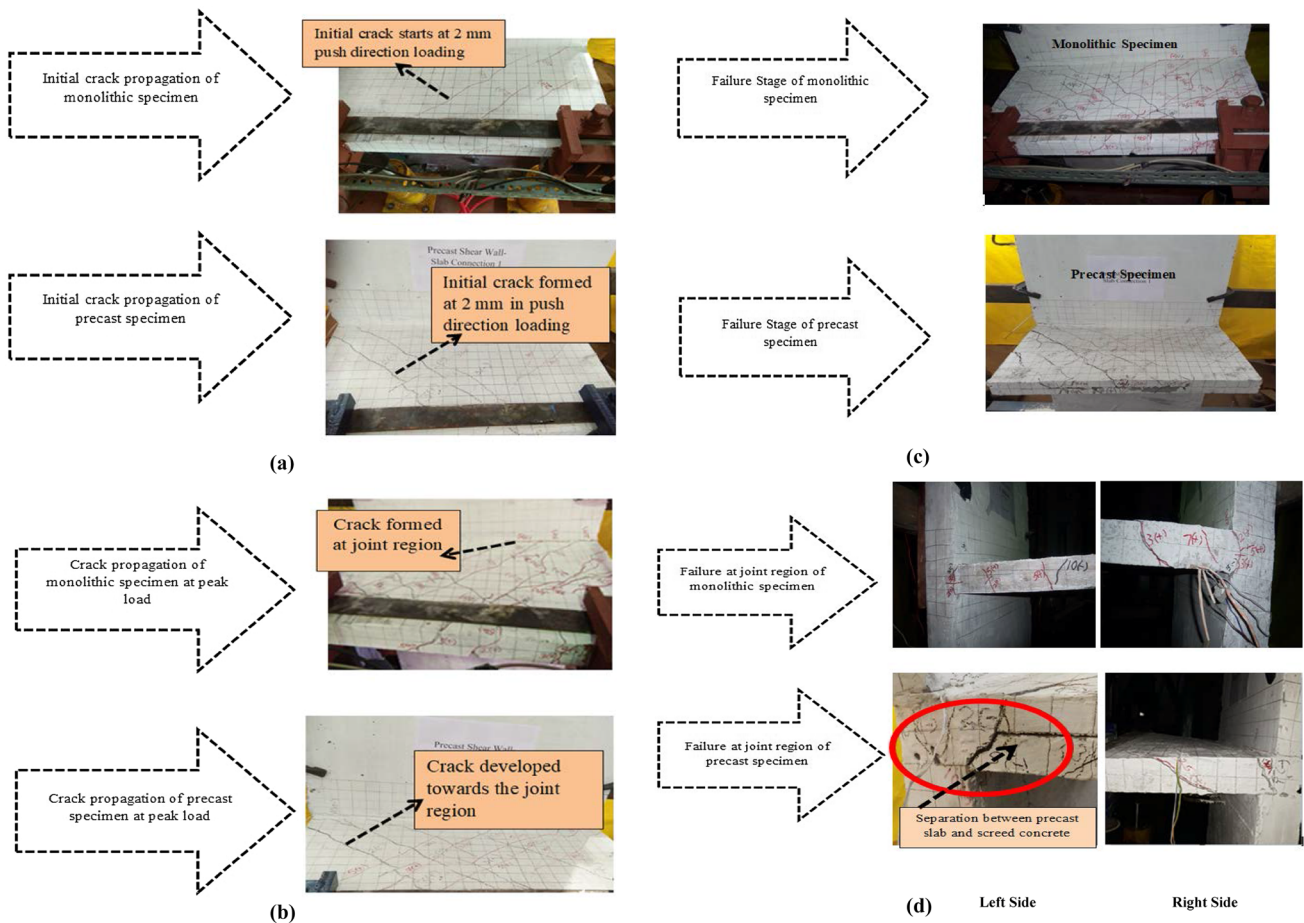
Crack pattern of monolithic and precast specimen. a Initial crack. b Crack propagation at peak load. c Failure stage. d Failure of connection region
